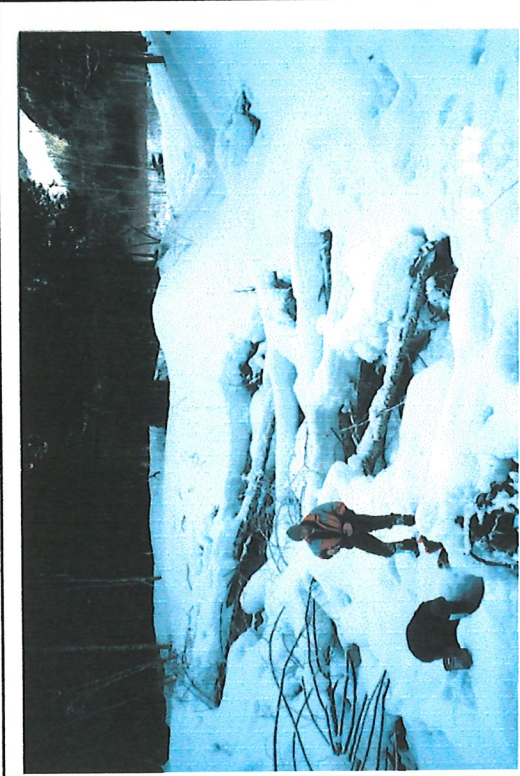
Looking downstream at constructed Pond 4 (alcove pond)
